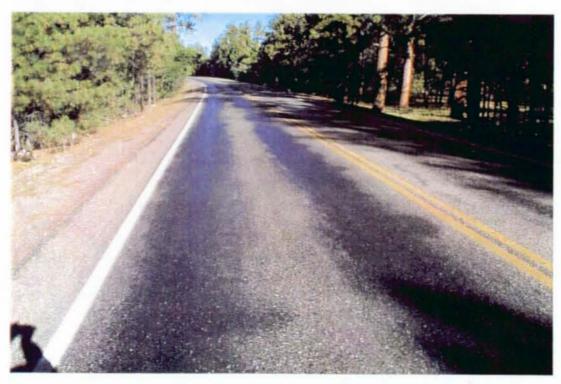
MP 8.44 - Heavy Bleeding, looking backwards.
